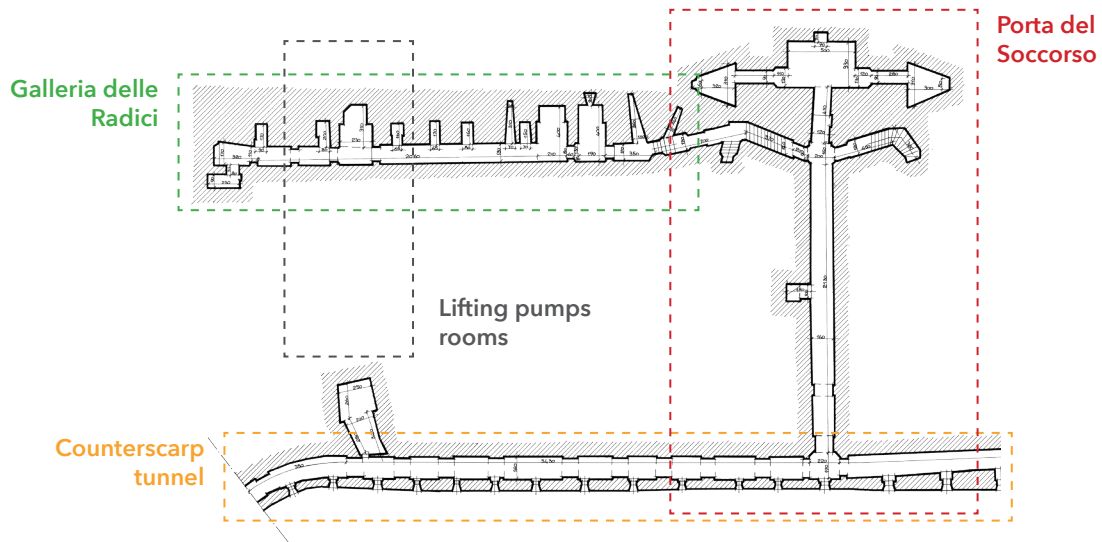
m Plan of the lower floor of Porta del Soccorso and Galleria delle Radici. The lifting pump rooms are not visible in the plan because they are part of a municipal system and are not accessible from the castle.
